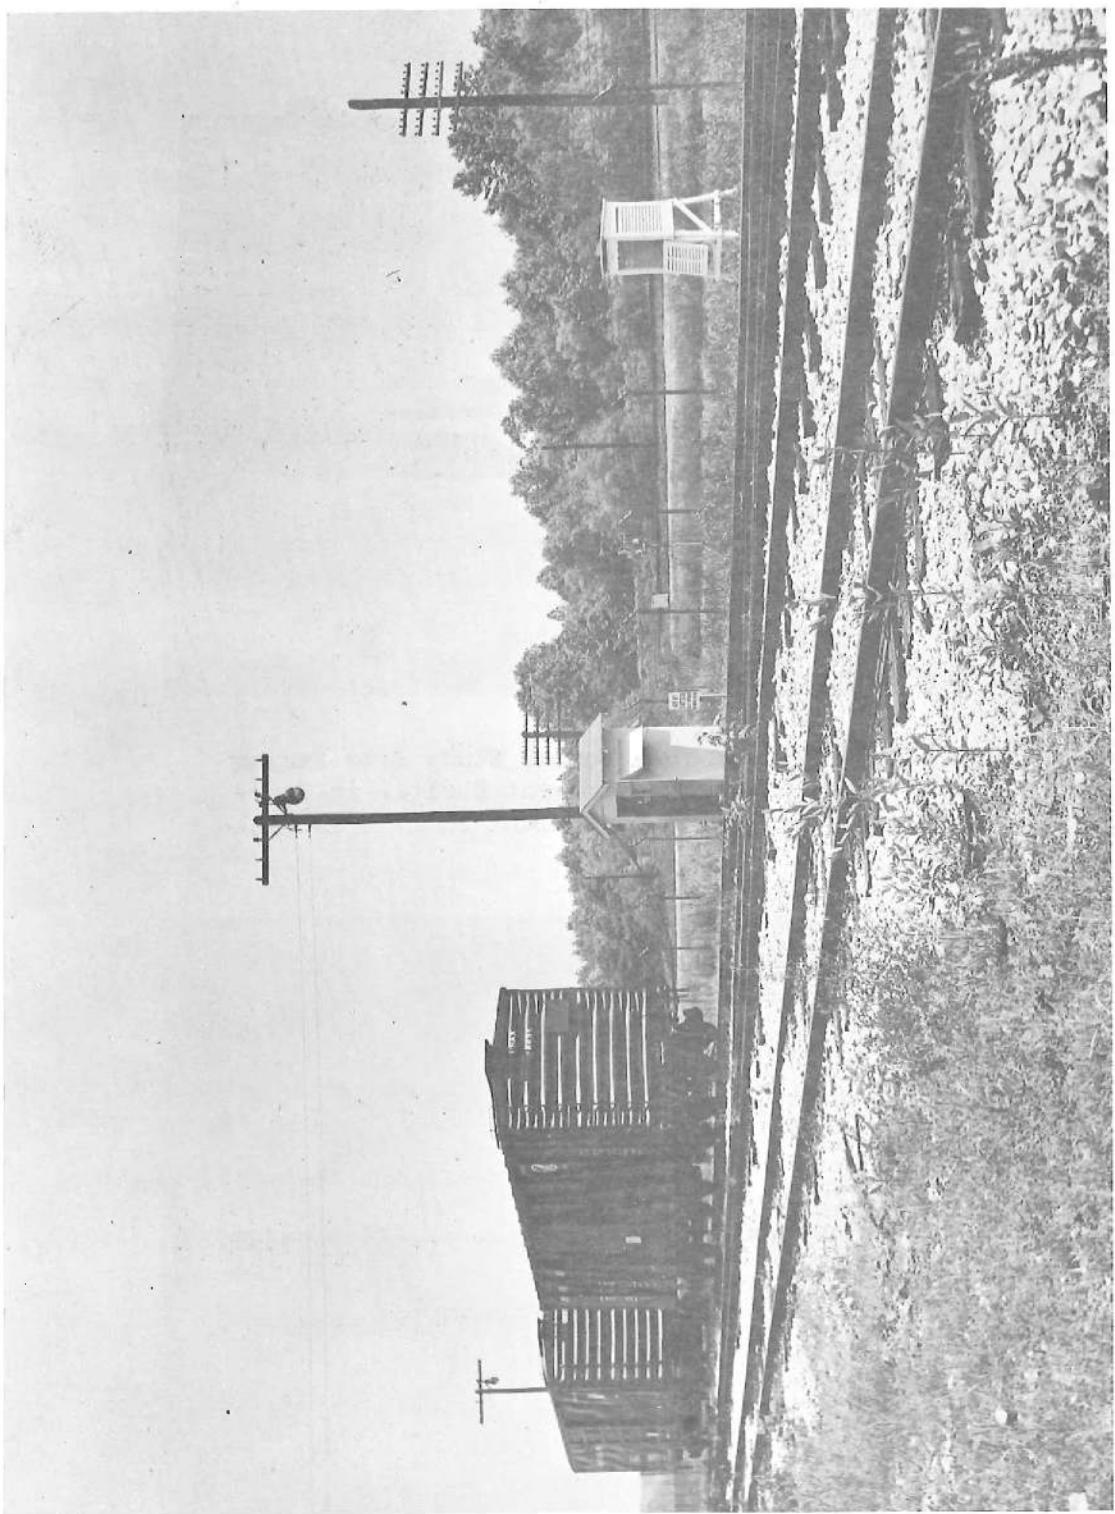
View of Yuma Boxcar Study Site - Facing South.
